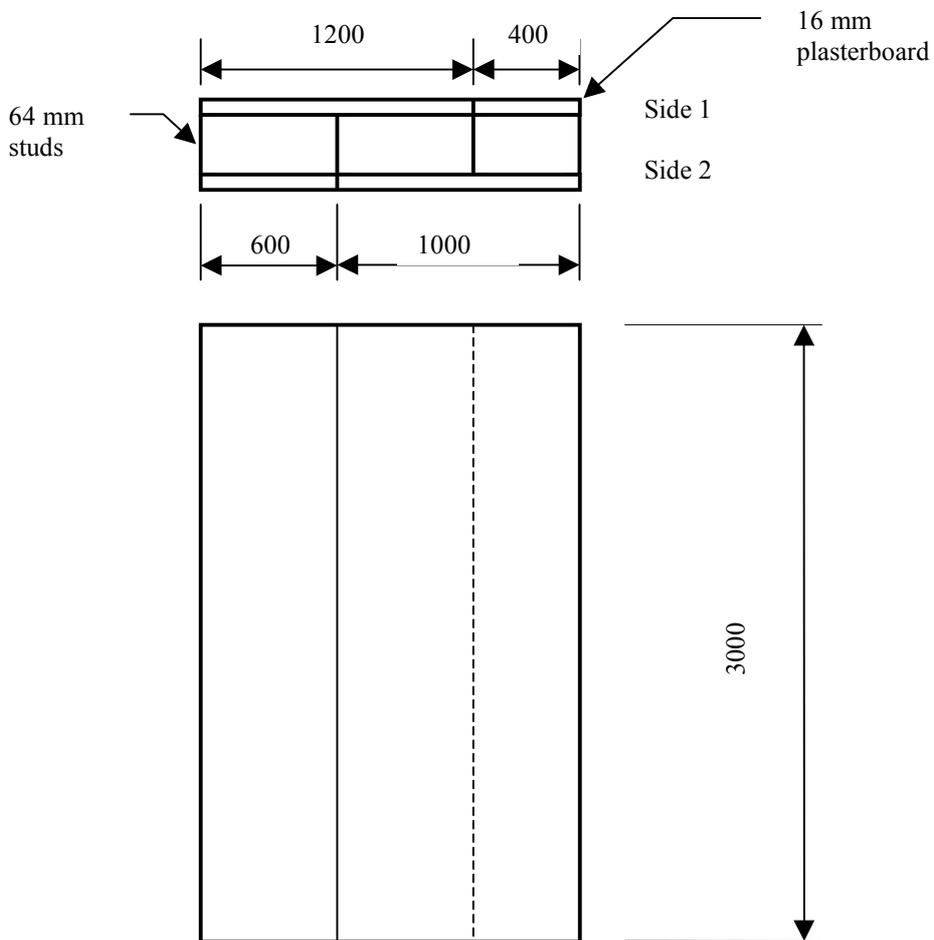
Standard-workmanship plasterboard test wall for BHP furnace tests.
